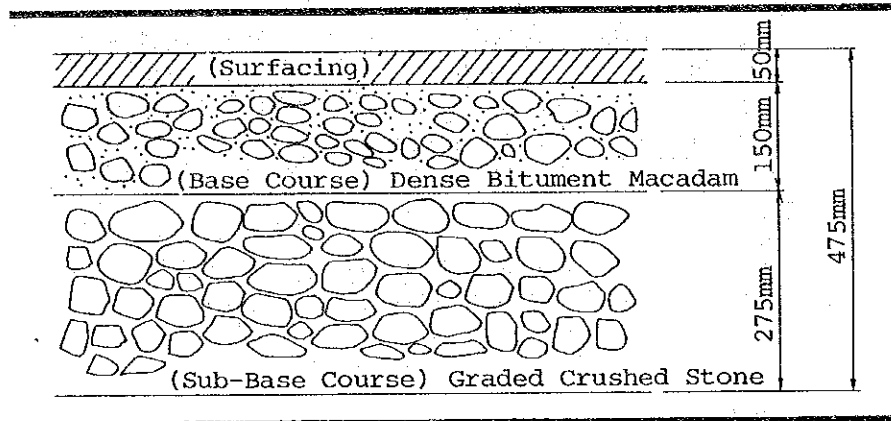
MEASUREMENT OF PAVEMENT STRUCTURE
